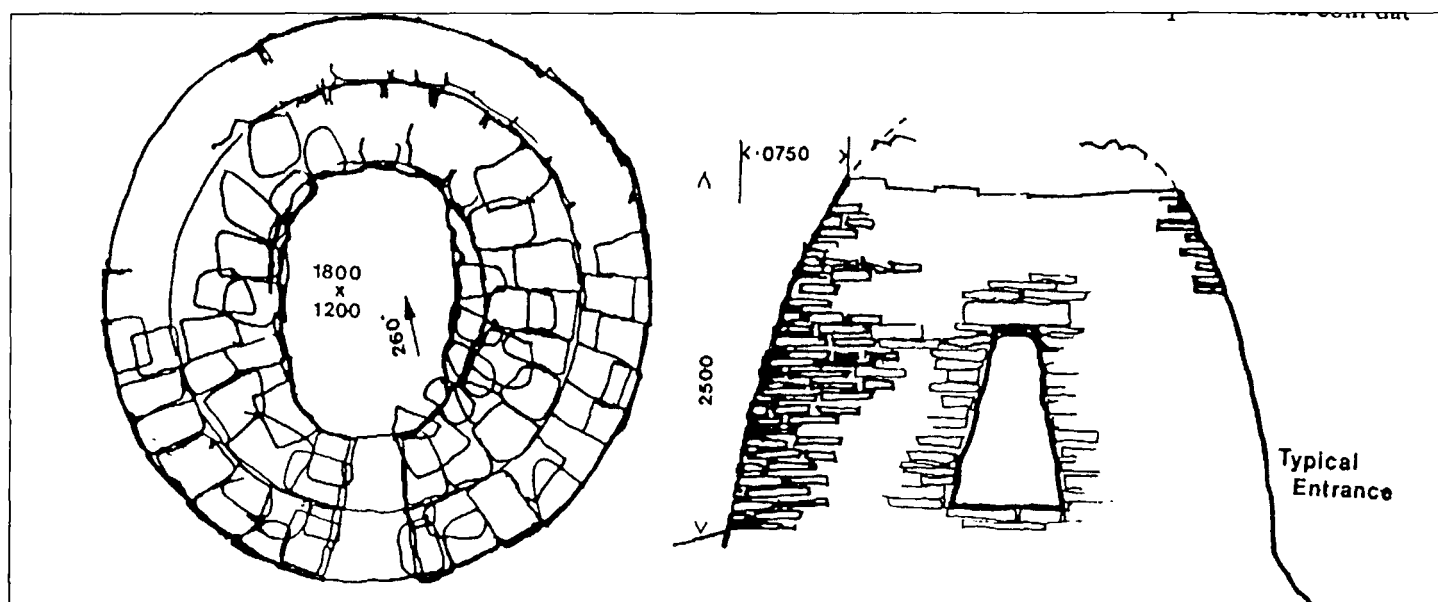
Sketch plan and elevation of tomb at Zukayt (Site 23) (after de Cardi, Collier & Doe 1976: fig.302, 159)
